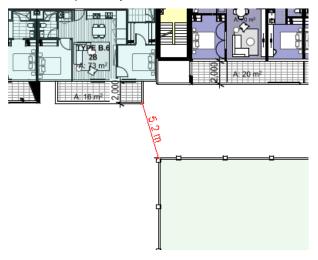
Distance between the Urban Anchor apartment and the outdoor playground
